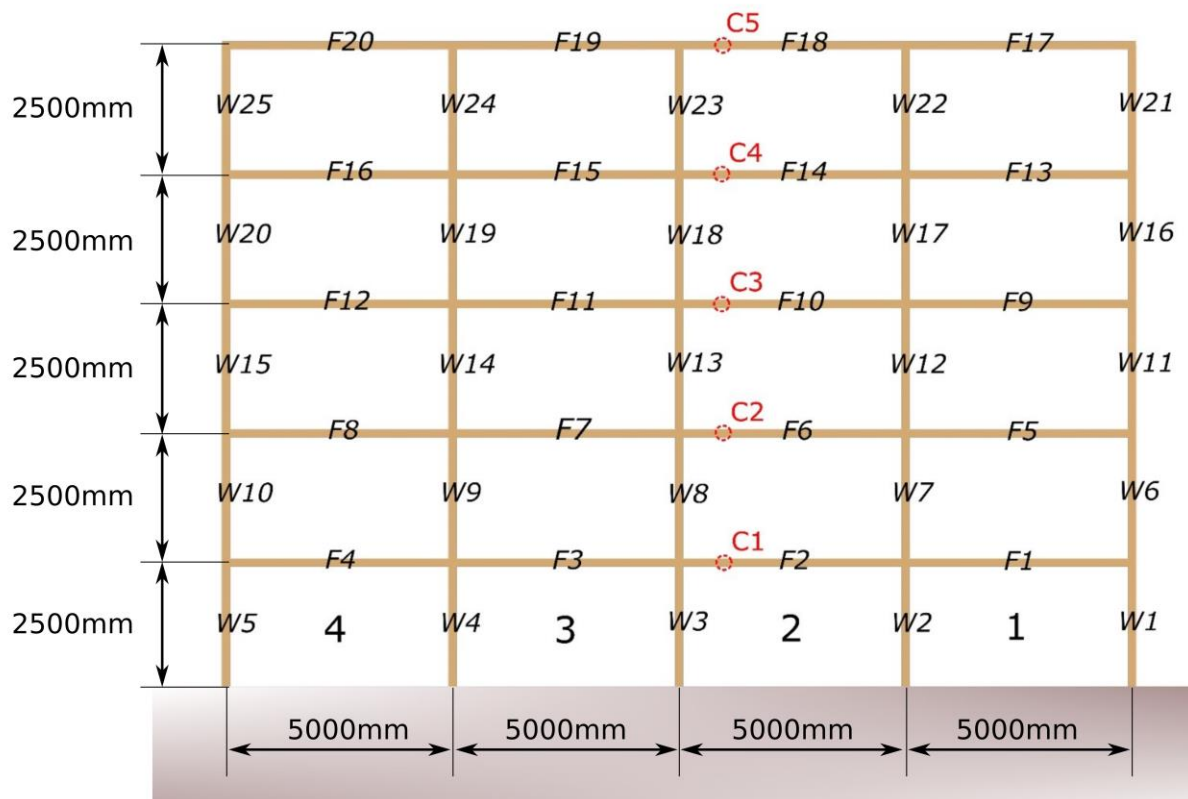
The numbering of structural elements, connections, and ground floor bays.
